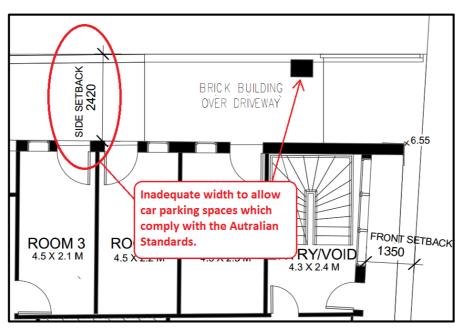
Extract of the applicant's revised plans showing the western side setback of the building where the two car parking spaces were to be located under the previous DA No. 147/86. Concerns are raised over the adequacy of this area to accommodate the intended parking given the dimensions appear incapable of accommodating car parking spaces to comply with the Australian Standards.
